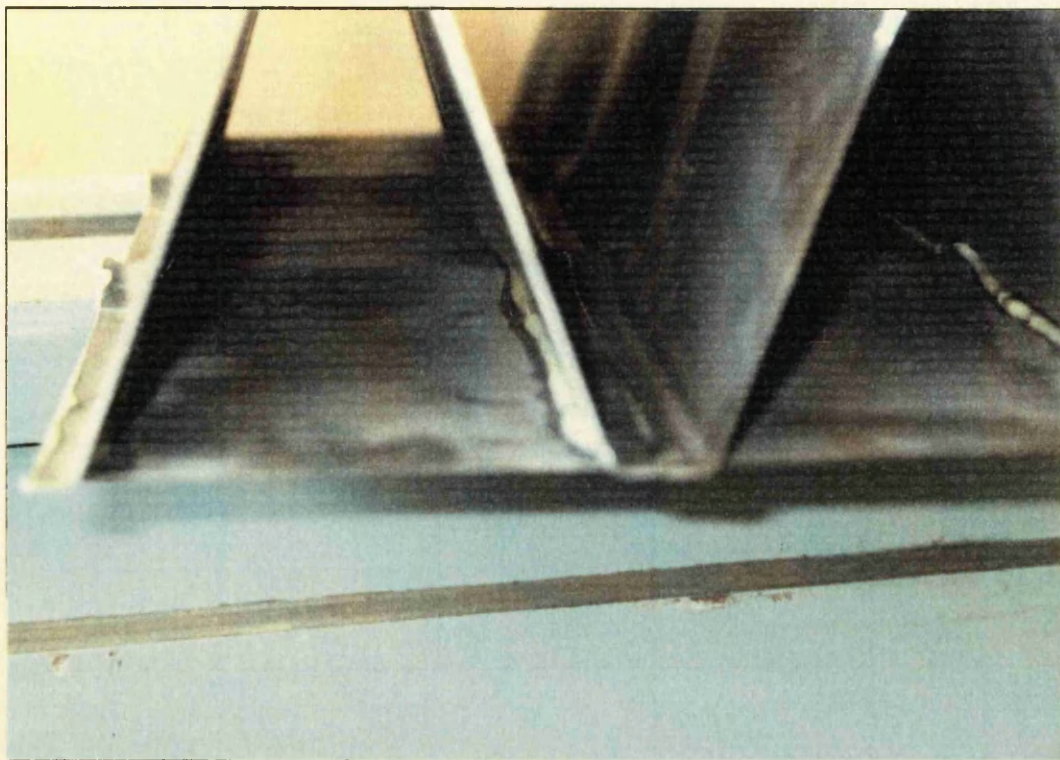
Model 3-4b: internal detail of the local deformation of the top plate
